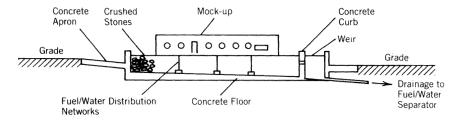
A concrete burn area structure. (Source: Reference 4)
